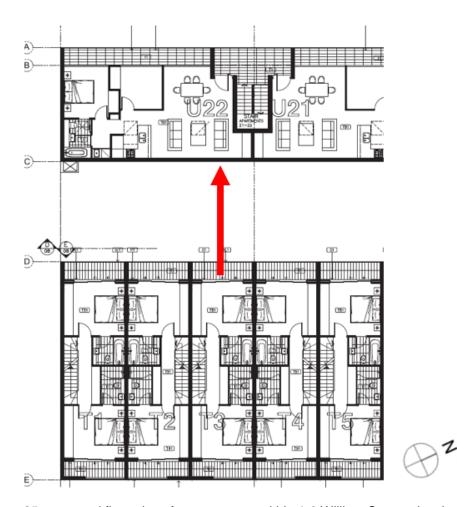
approved floor plans for apartments within 1-9 William Street, showing balconies facing blank walls opposite
